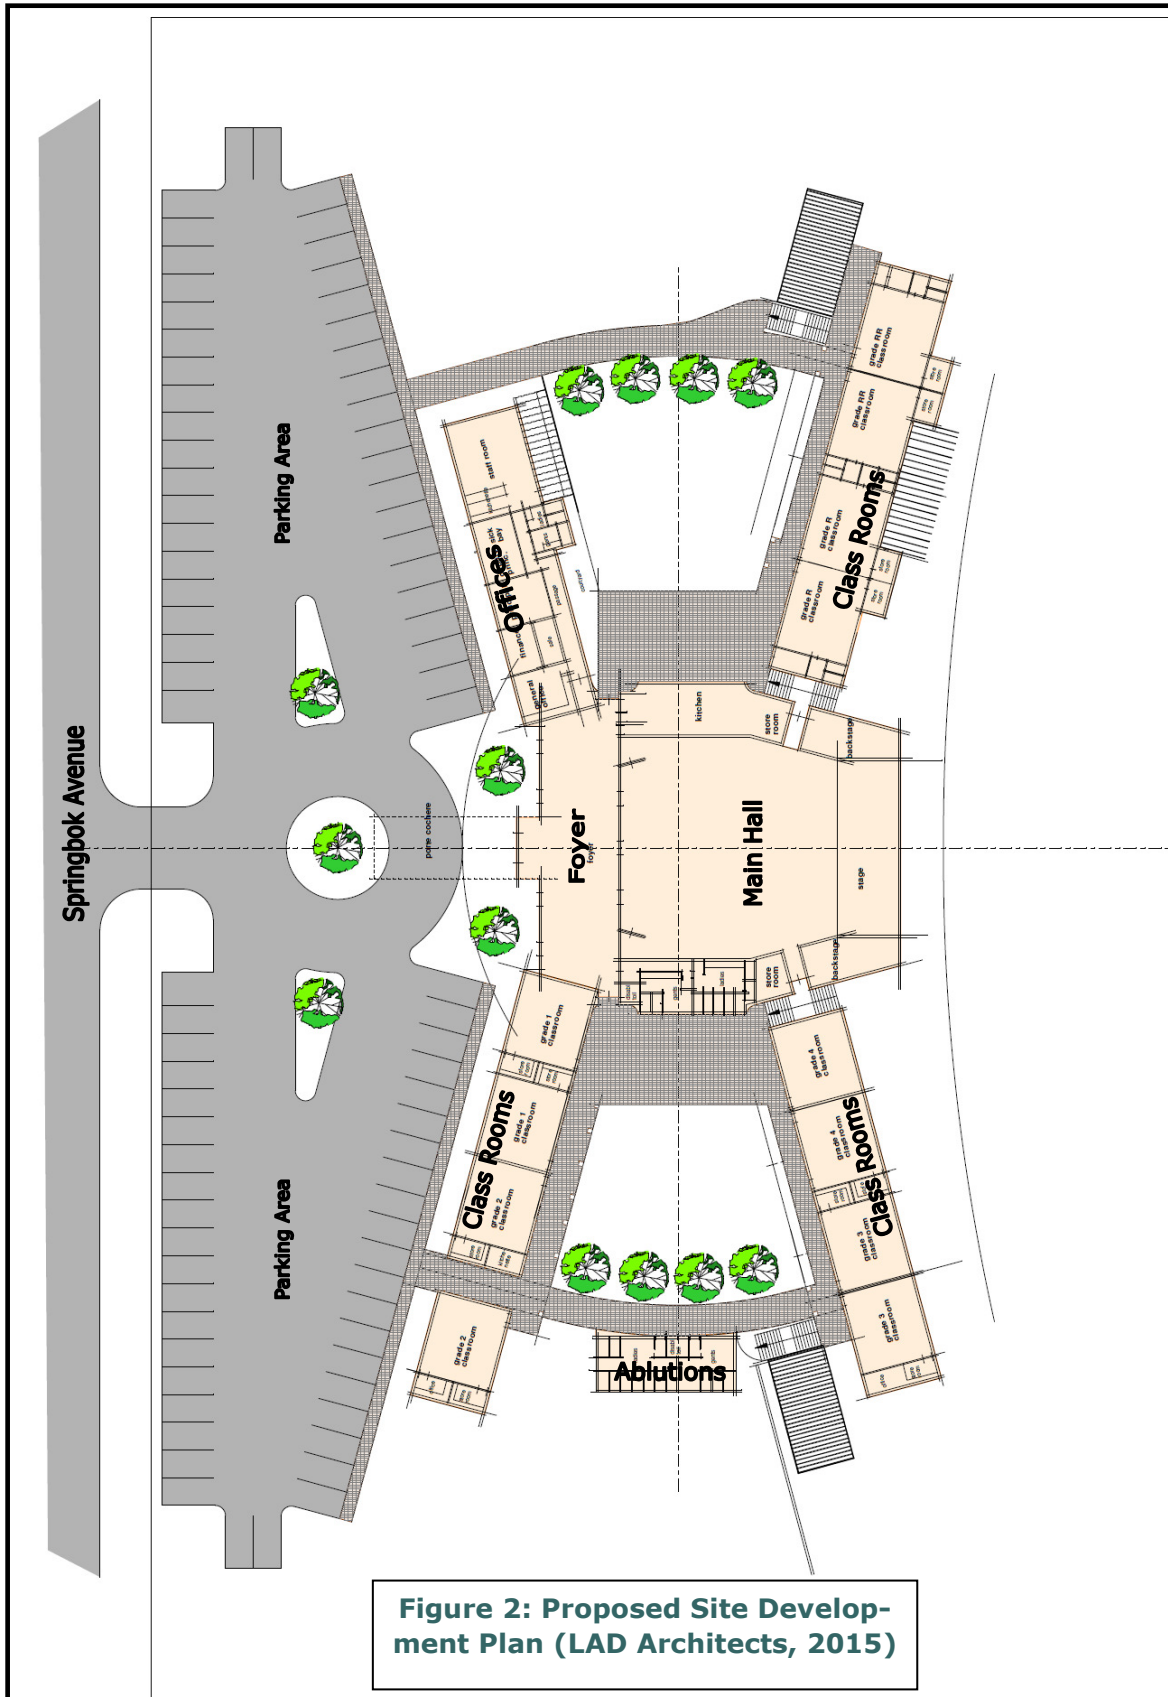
Proposed Site Development Plan (LAD Architects, 2015)
